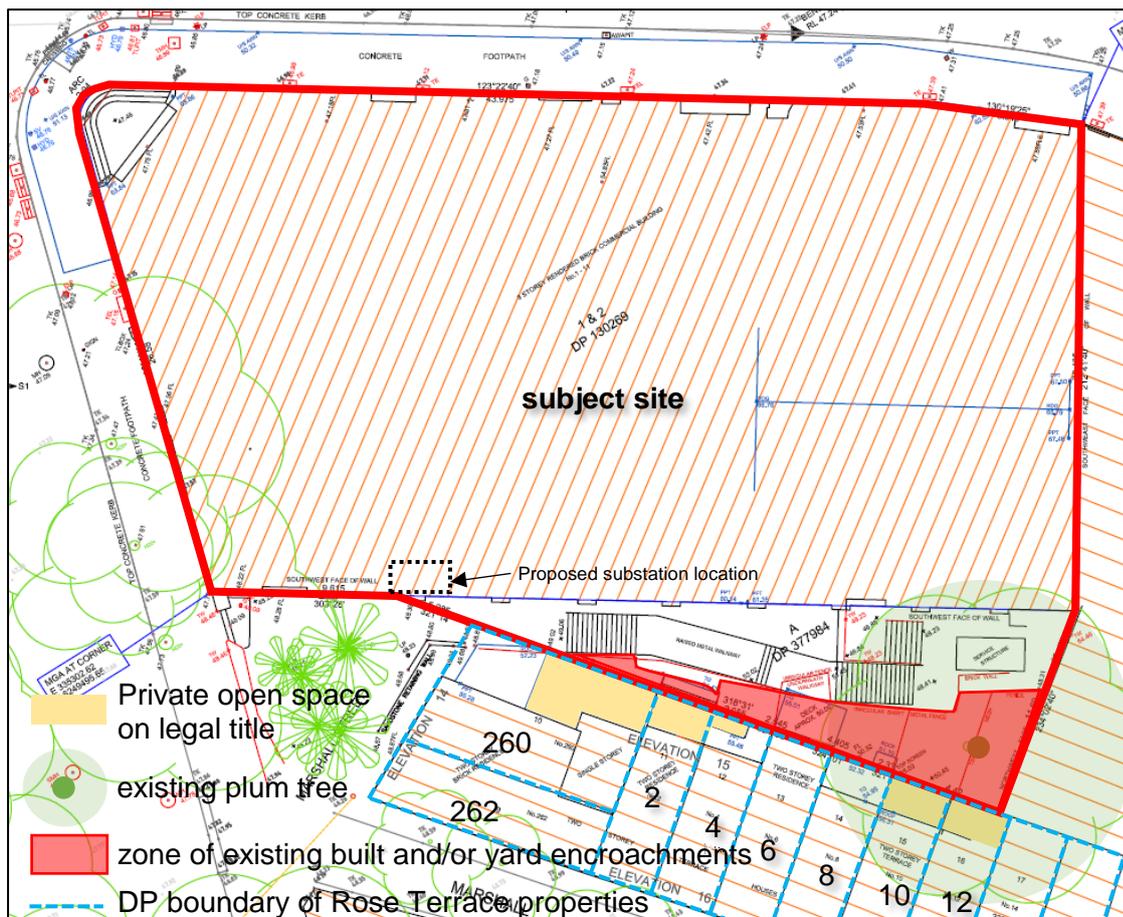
Survey of subject site and existing encroachments of 2 to 12 Rose Terrace, Paddington
